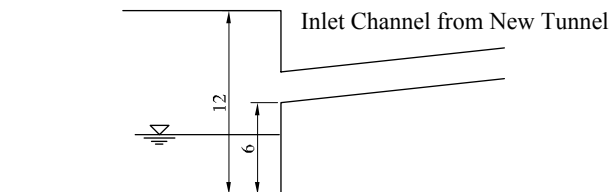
Condition of the New Reservoir with the Exit of New Tunnel
